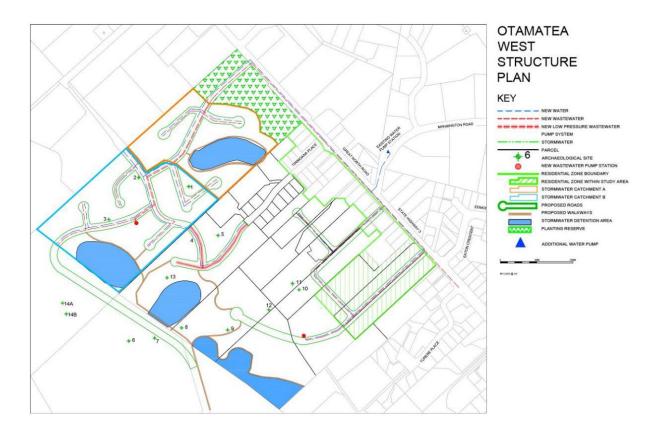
Road Layout Proposed by 'Otamatea West Structure Plan' (Source: Figure 12 Opus 2017)
